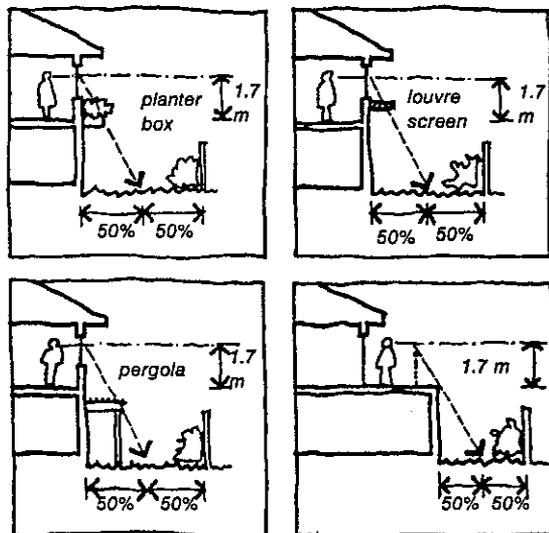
Ways to achieve privacy between ground floor and first floor units. (Source: Amcord.)
